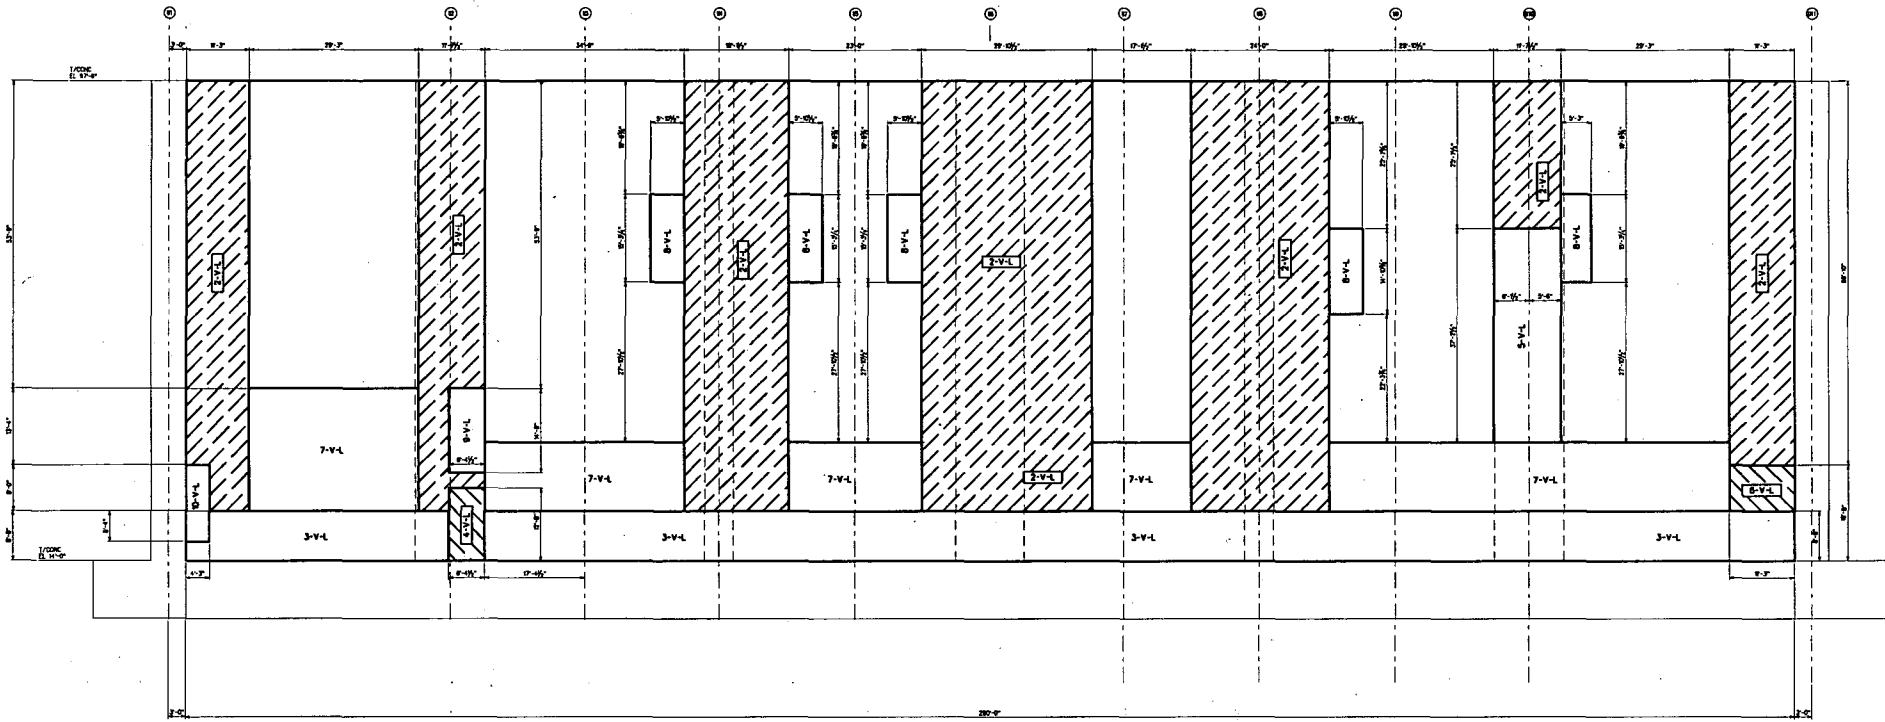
BASIN SOUTH WALL LOOKING NORTH
